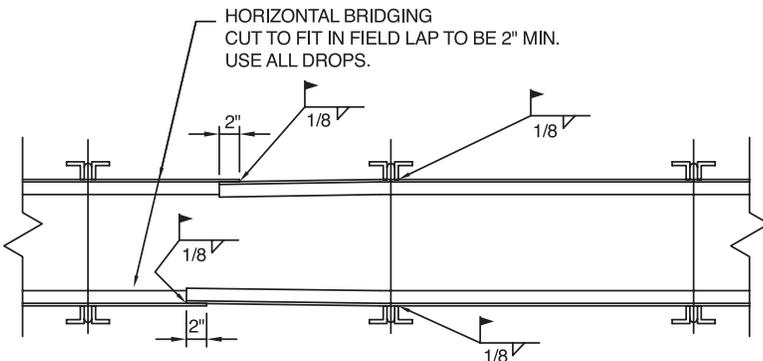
HORIZONTAL BRIDGING LAP JOINTS AND ATTACHMENT TO JOISTS
